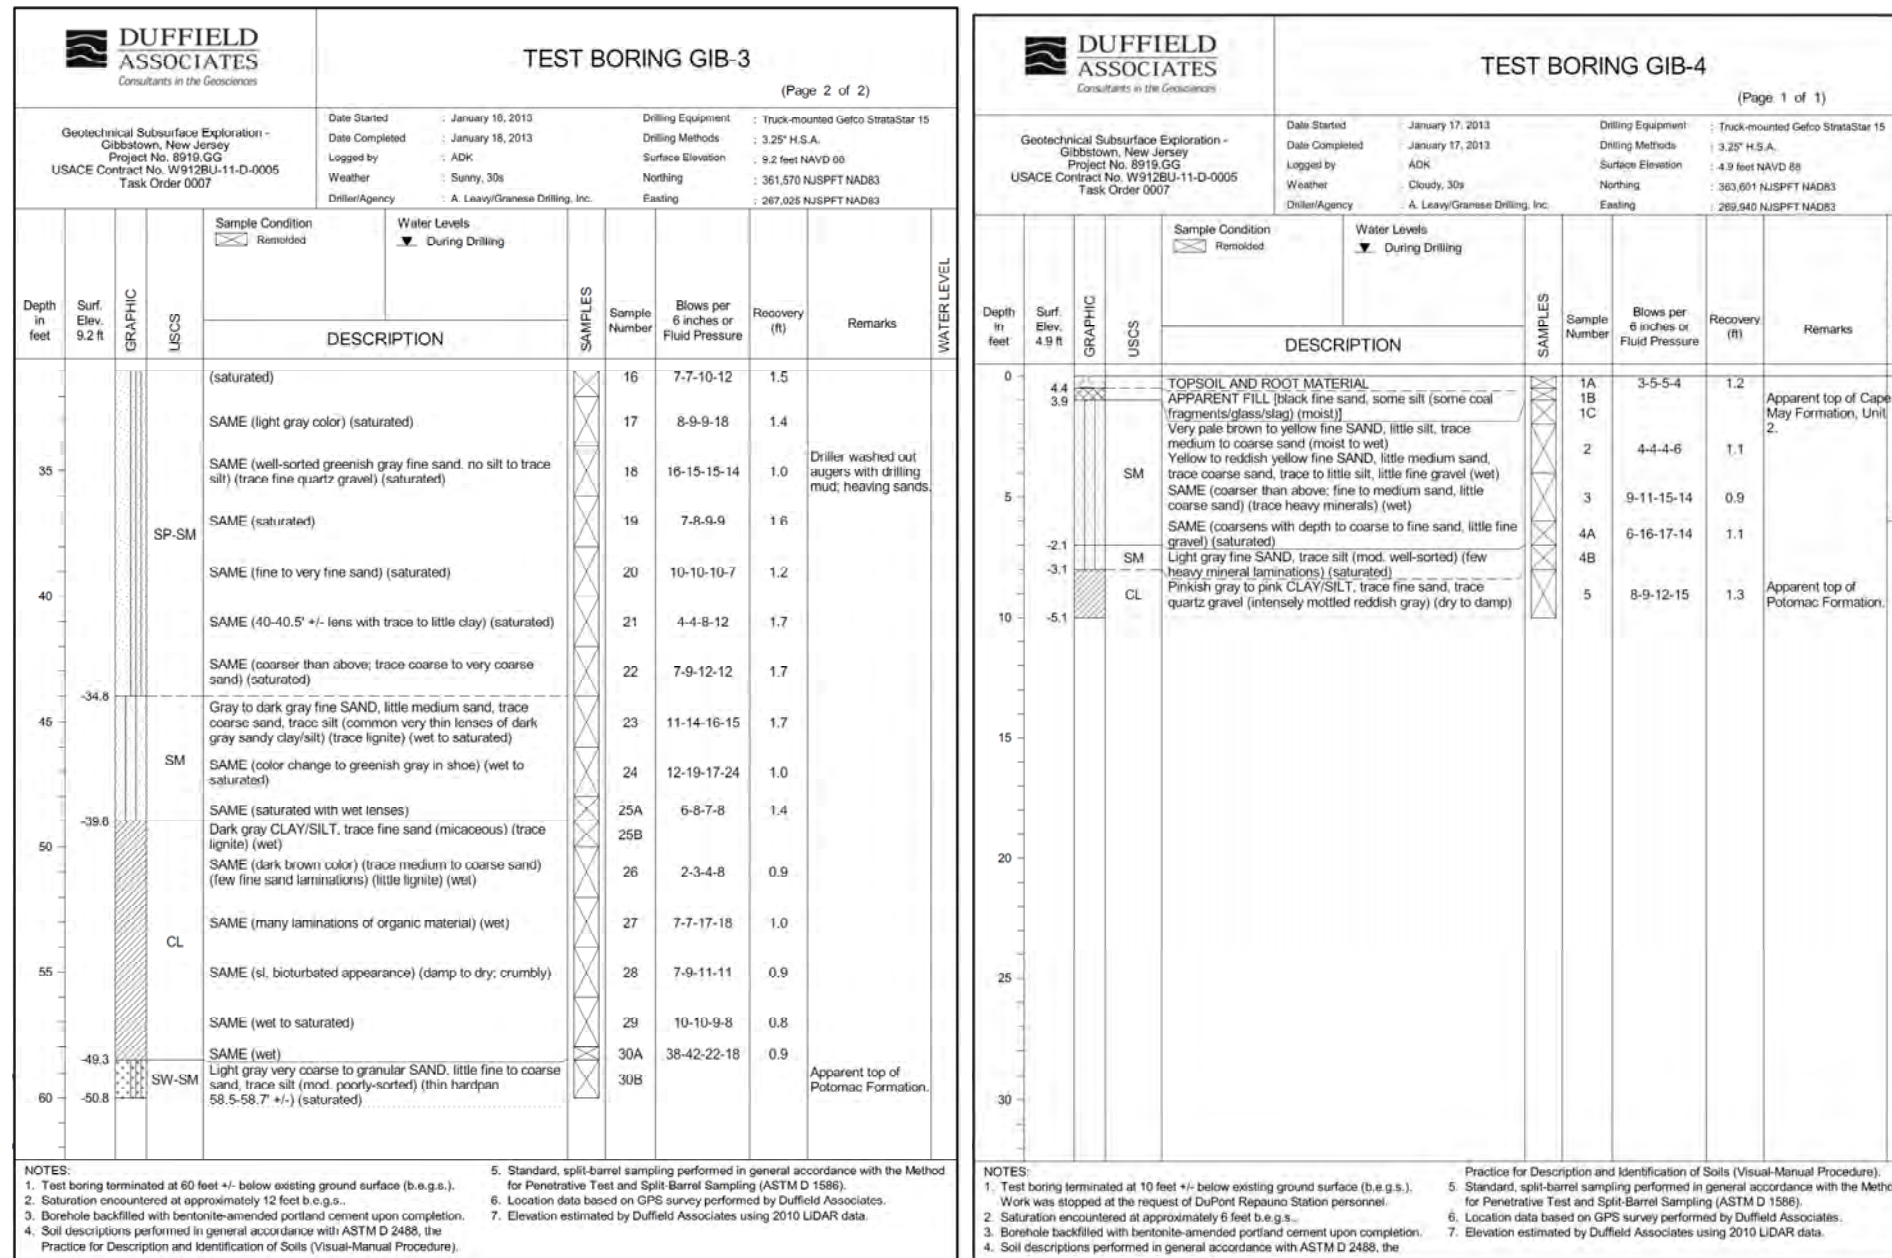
con't: Geotechnical Subsurface Exploration, Gibbstown, New Jersey – Test Boring Logs
